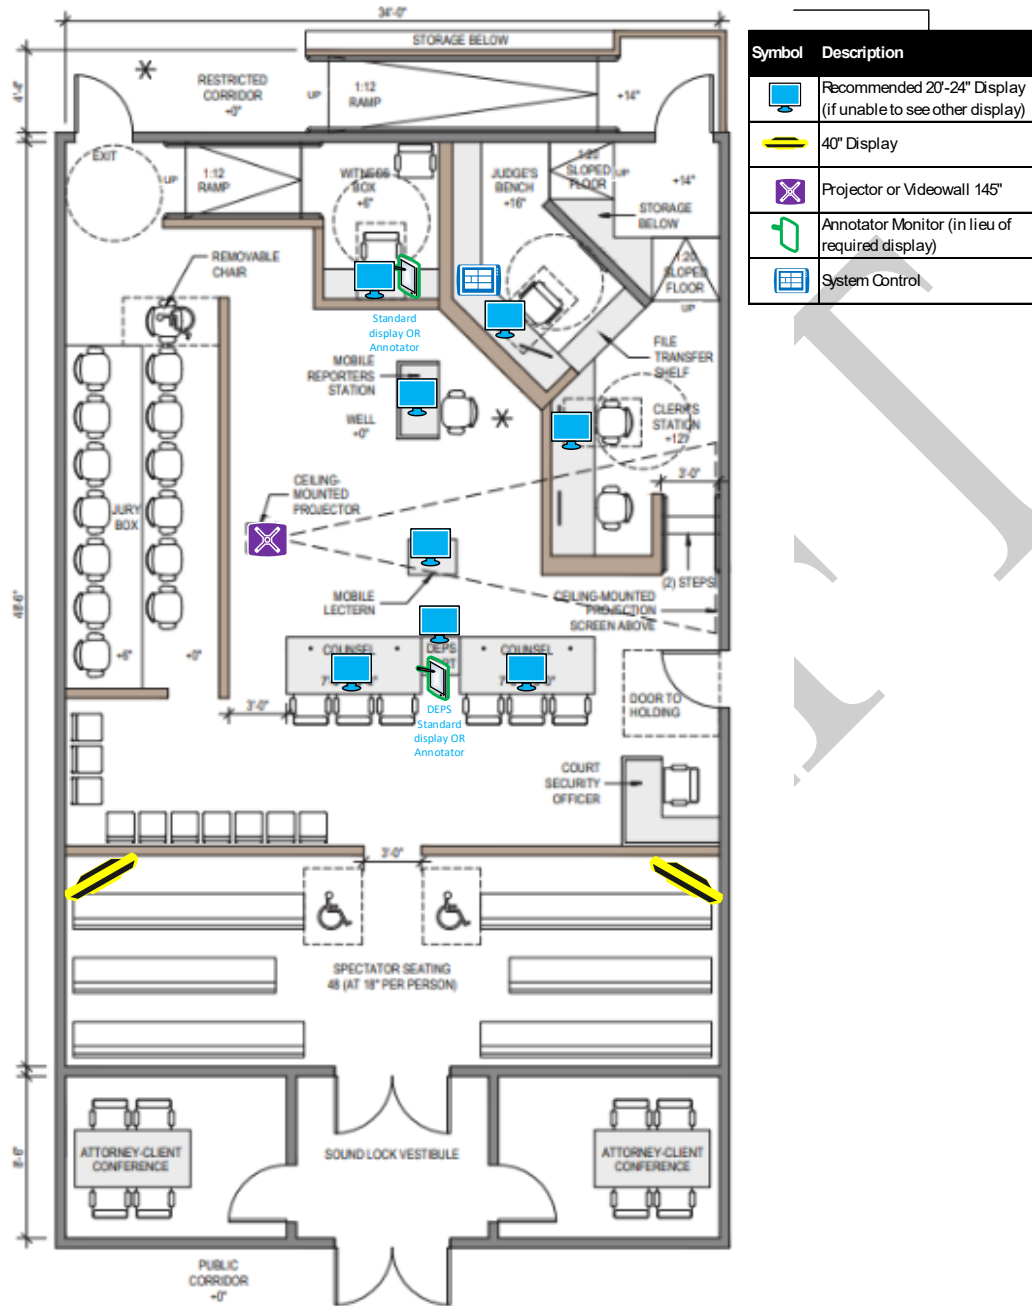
Typical Trial Courtroom—Corner Bench A
